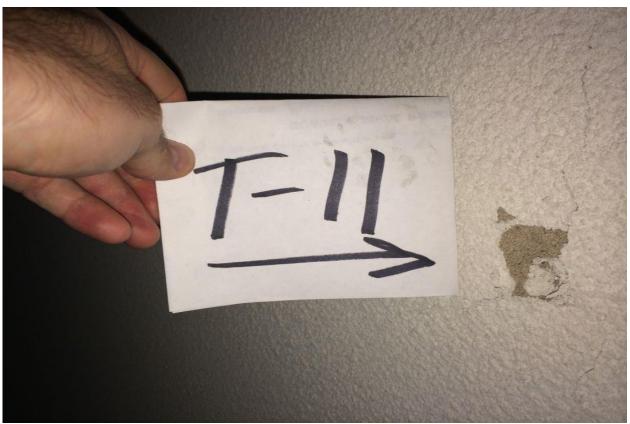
Laboratory analyses detected 20% chrysotile asbestos within spray on surfacing material sample TS-11 collected from the Theatre Building upstairs projection room ceiling.
